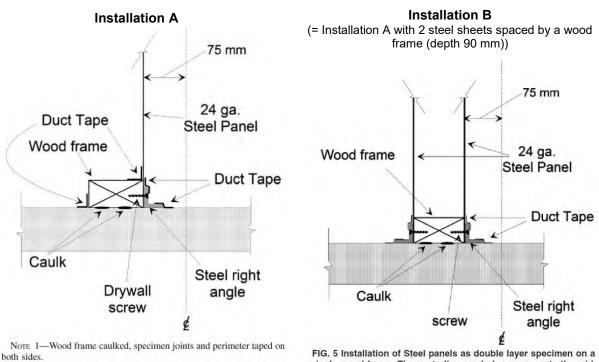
Installation of Reference Specimen Showing Caulking of Wood Frame and the Taping of the Specimen Joints and Perimeter on Both Sides FIG. 5 Installation of Steel panels as double layer specimen on a single wood frame. The centerline symbol, ¢, represents the midplane of the test opening between two rooms.
